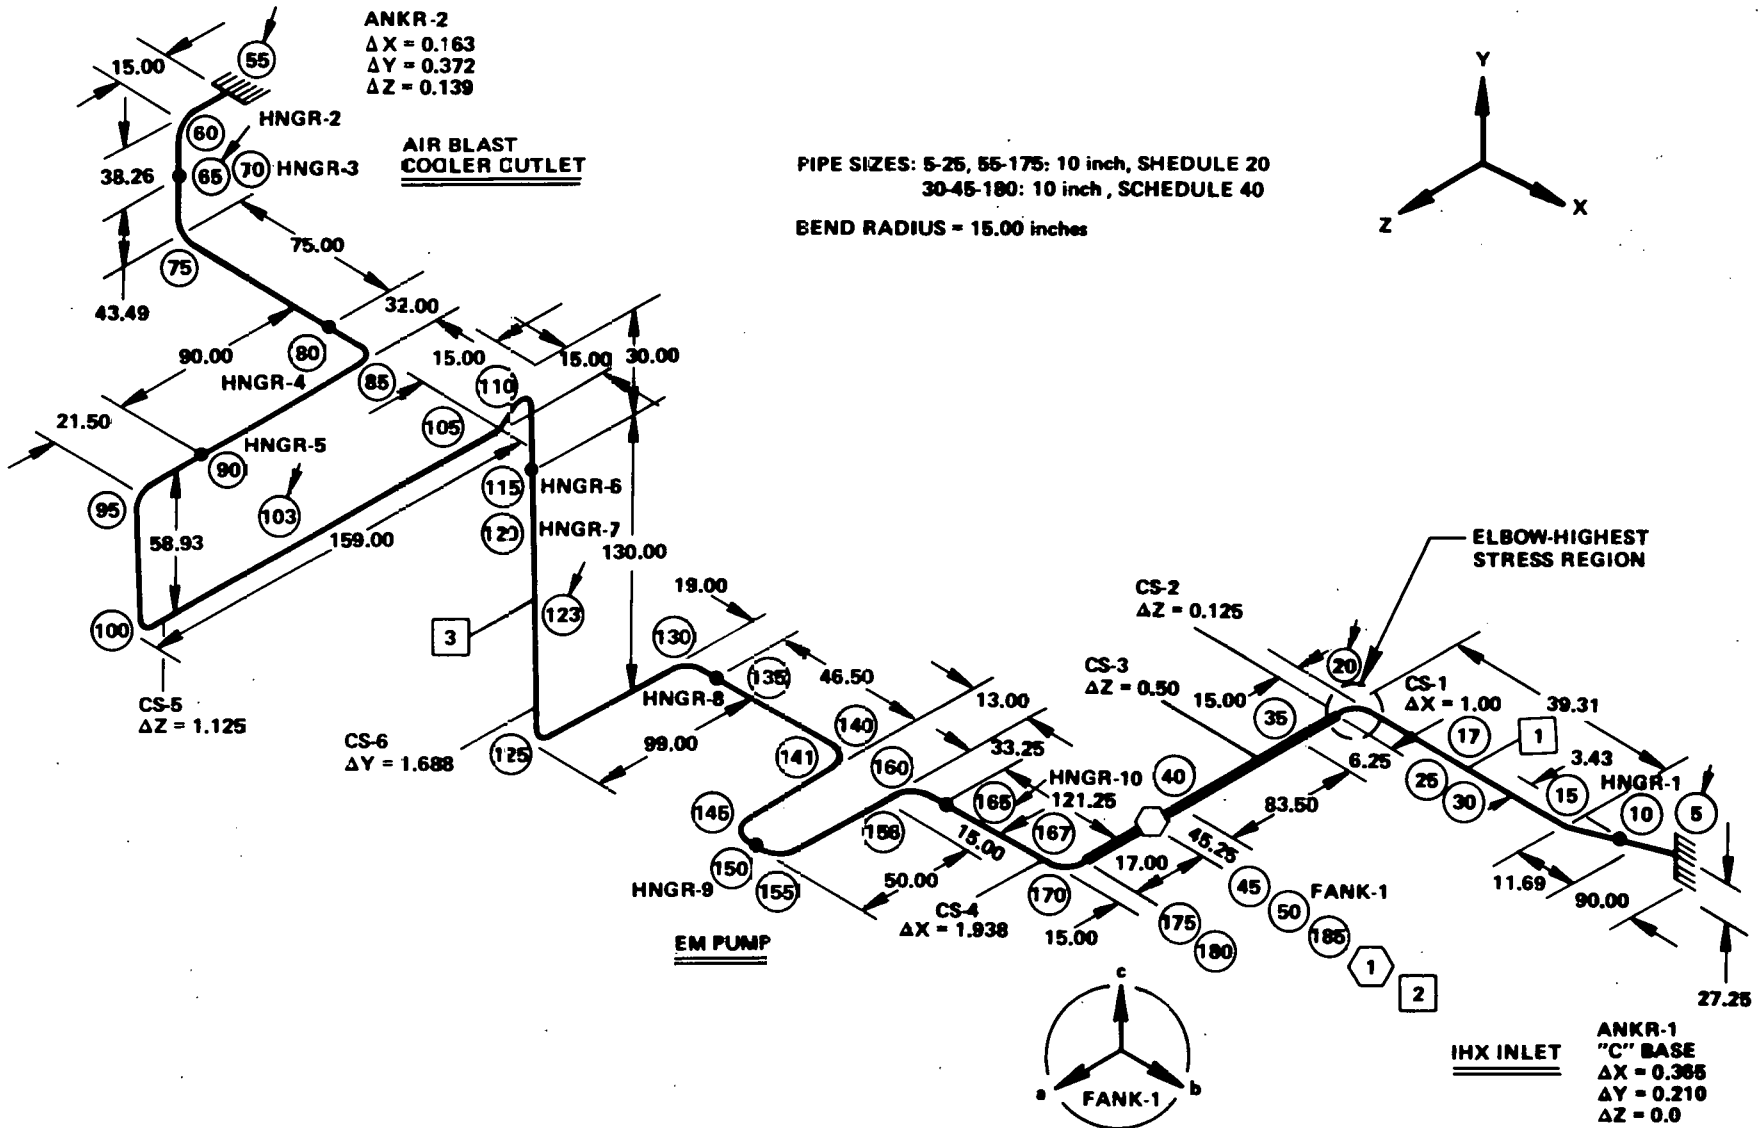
B1-12. Main Secondary Cold Sodium Piping: Outlet Header to IHX
